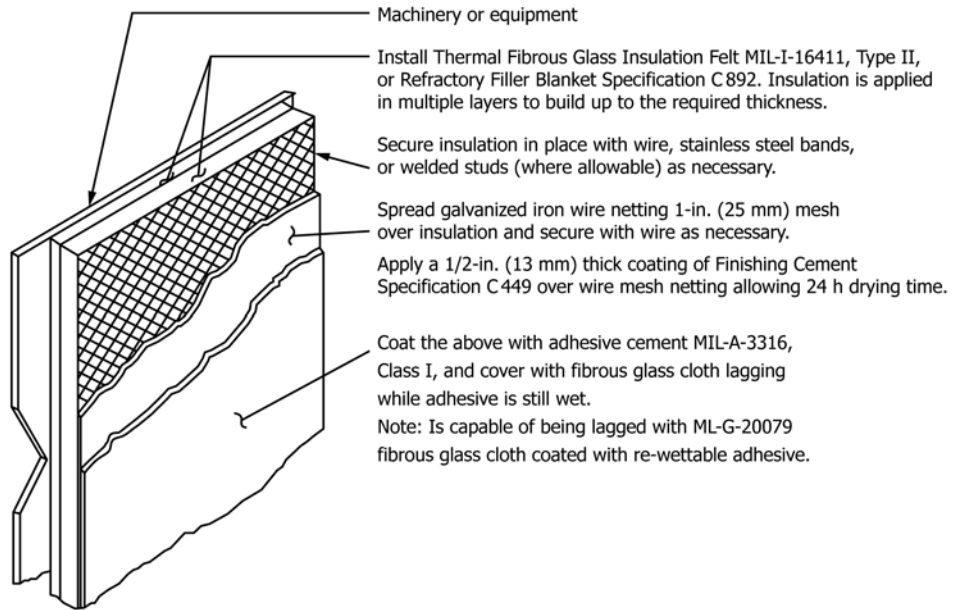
Installation of Thermal Glass Fiber Felt Blanket Insulation (MIL-I-16411) or Refractory Fiber Felt Blanket Insulation (Specification C892) on Machinery and Equipment (126 to 1200°F) (52 to 649°C)
